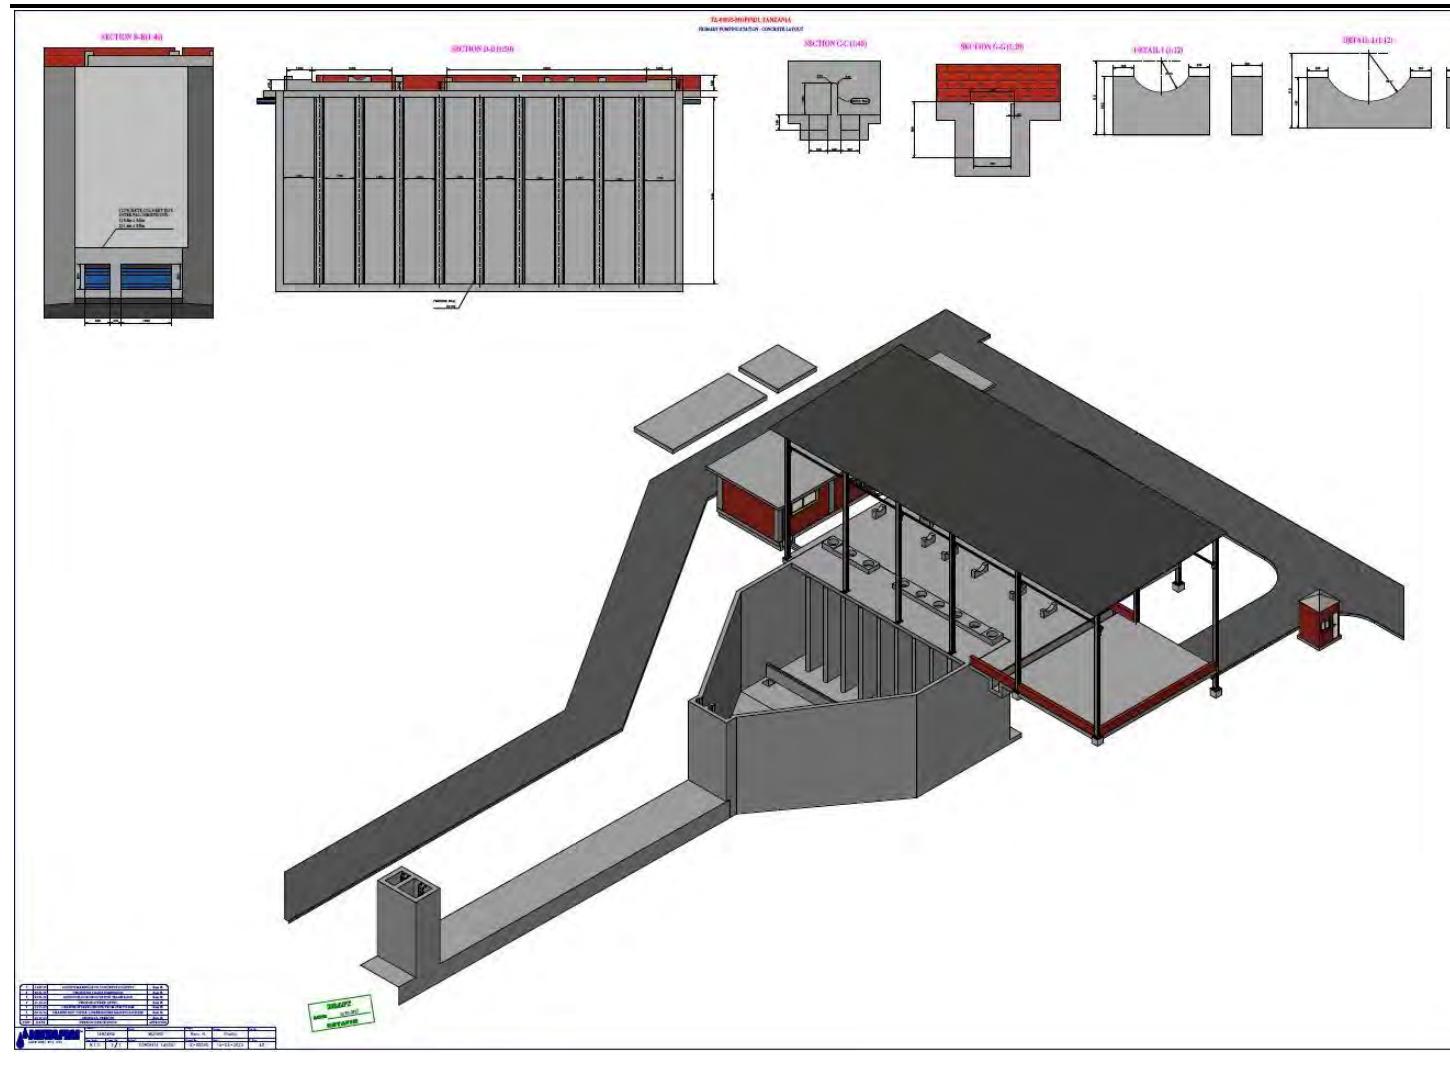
PRIMARY PUMPING STATION - CONCRETE
